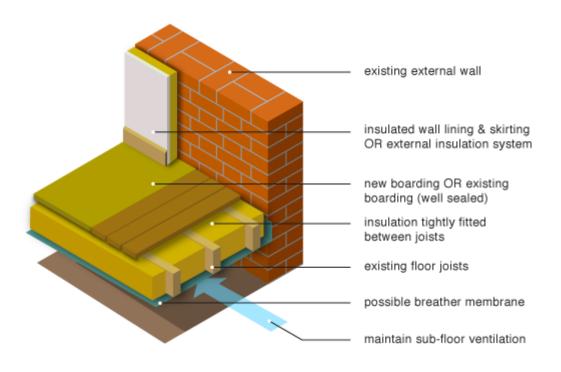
Typical suspended timber floor build-up (Greenspec, 2013)
